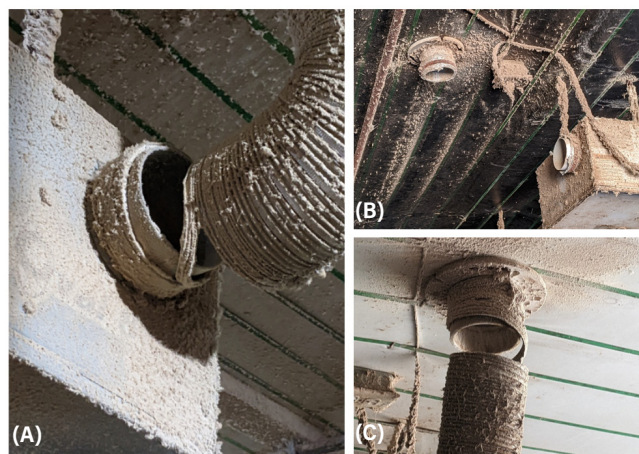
Examples (A), (B), and (C) of the air intake ducts being broken or completely missing from radiant tube heaters in one house.
